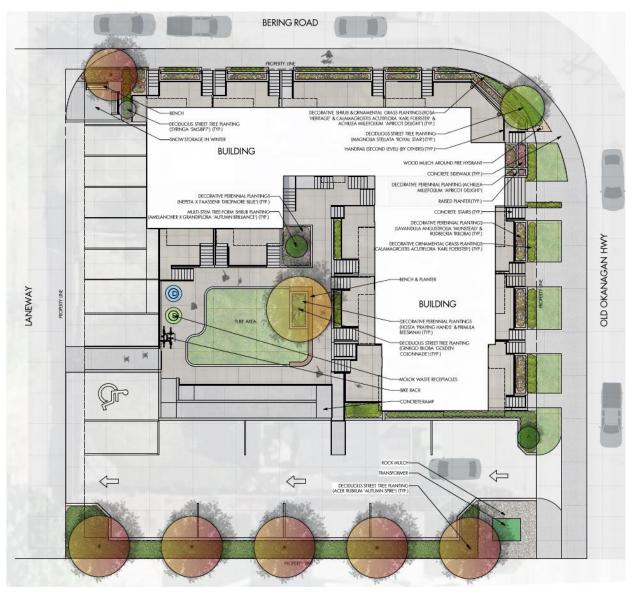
Site plan showing landscaping and designated pedestrian accesses to the site.
